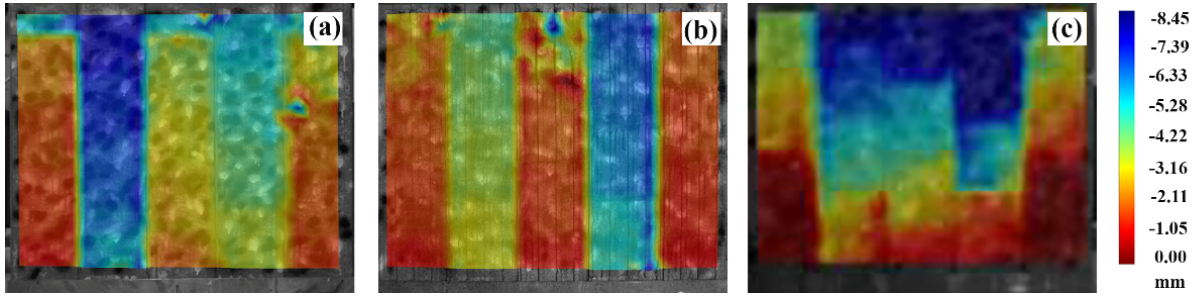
Vertical displacement  $\epsilon$  map under compression obtained through DIC: (a) bare earth block wallette, (b) fir board reinforced specimen and (c) GFRP reinforced specimen
